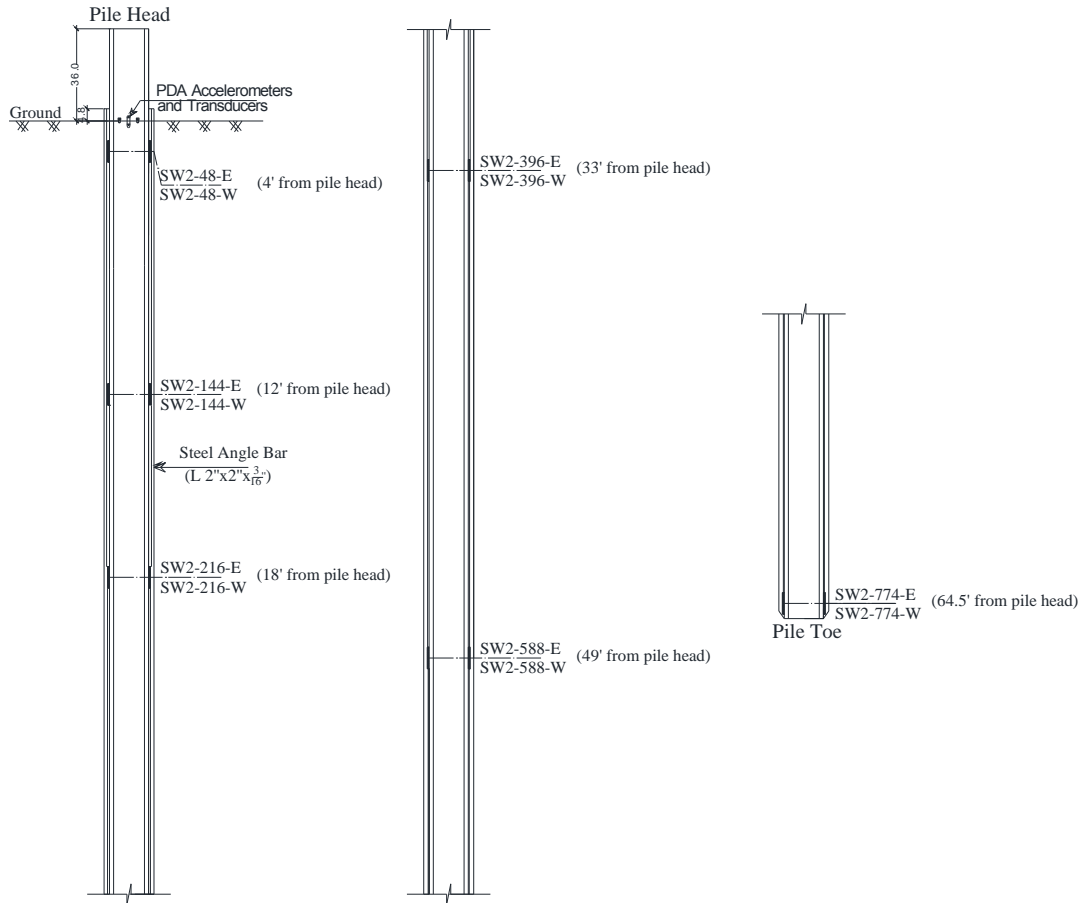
An elevation View of SW2 Showing the Locations of Instrumentation
